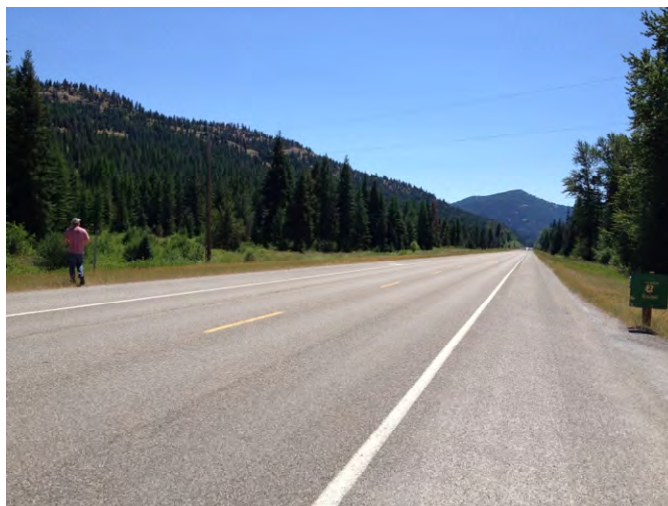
Segment 1, RP 58.3±, looking eastbound.
